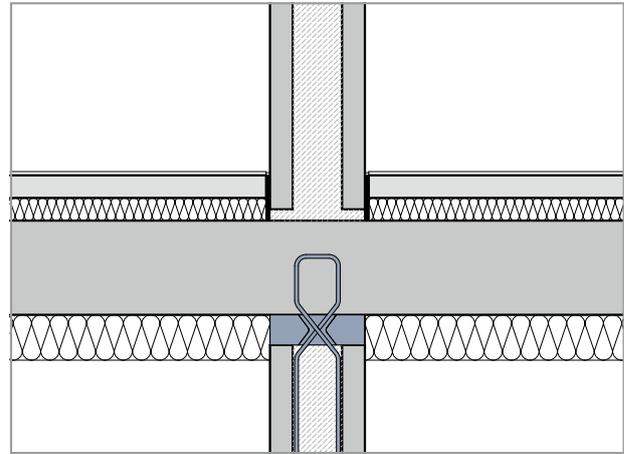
Schematic diagram Schöck Sconnex® type W with twin walls and under-slab insulation
